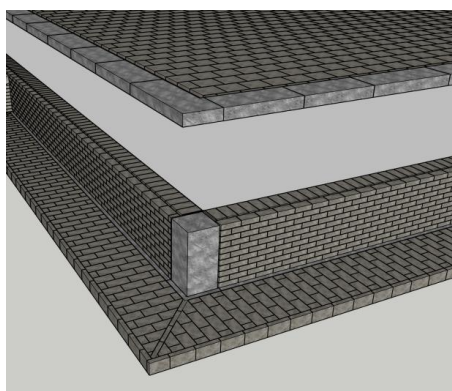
Detailed Modeling of Corner Columns and Bricks.
